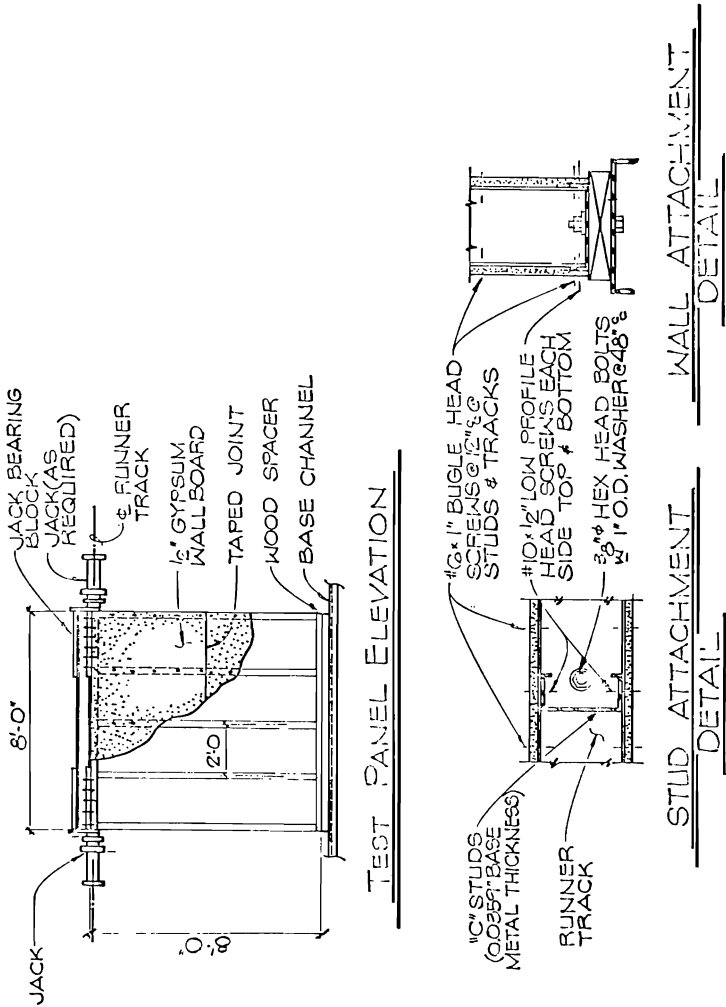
Test Assembly Plan & Details - Wall Type "E"
